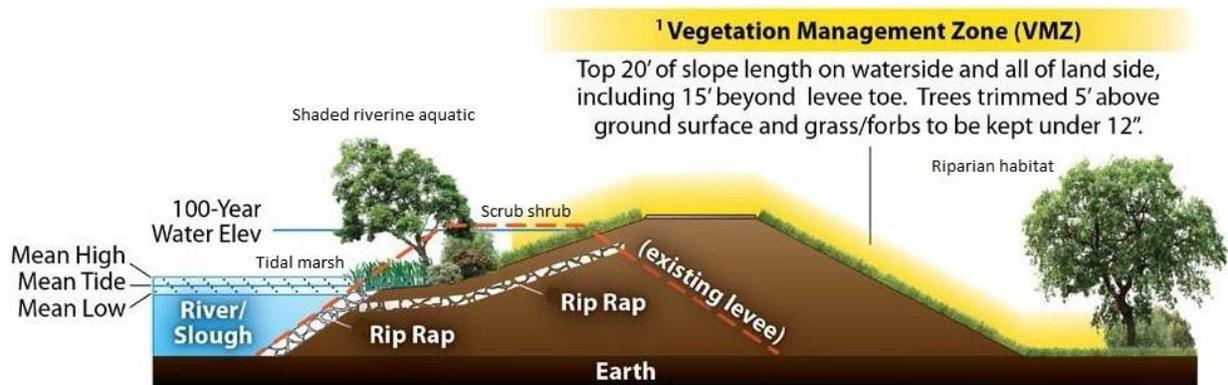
Schematic of extra-wide levee with waterside slope of levee graded into planting bench.
